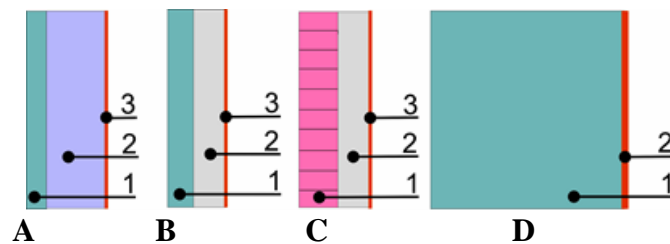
NS 71 façade panel types, composition [2, 3]: A – full height wall panel: 1. Concrete 6 cm, Ceramsite concrete 20 cm, 3. Compo mortar 1.5 cm; B – façade curtain wall: 1. Natural or pebble dashing concrete 8 cm, 2. Aerated light weight concrete blocks 12.5 cm, 3. Lime mortar 1.5 cm; C - Traditionally built façade: 1. Perforated face brick 12 cm, 2. Aerated light weight concrete blocks 10 cm, 3. Compo mortar 1.5 cm; D – Façade column: 1. Concrete 60 cm, 2. Thermal mortar 3 cm.
